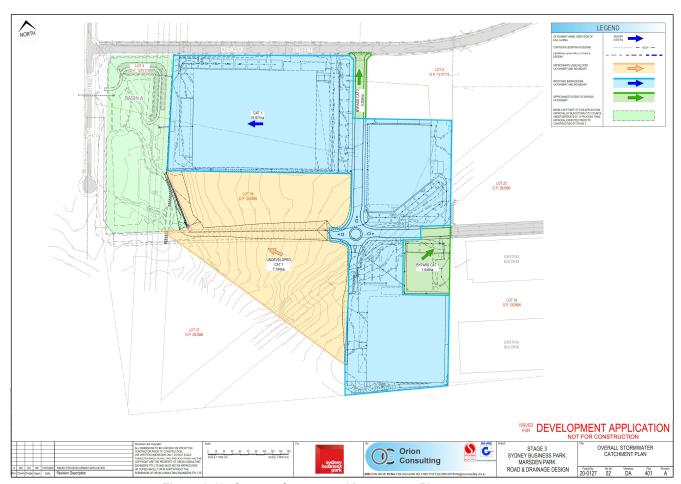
Concept Stormwater Management Plan (Source: Orion)
